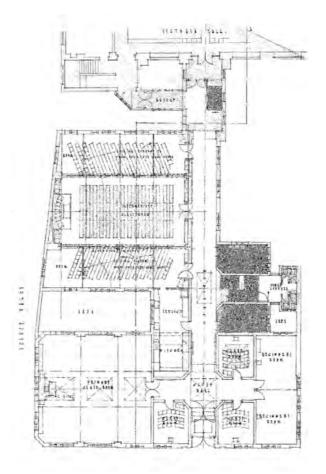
Ground Floor Plan of the Walker Memorial School. Source: Bradshaw Gass and Hope.
